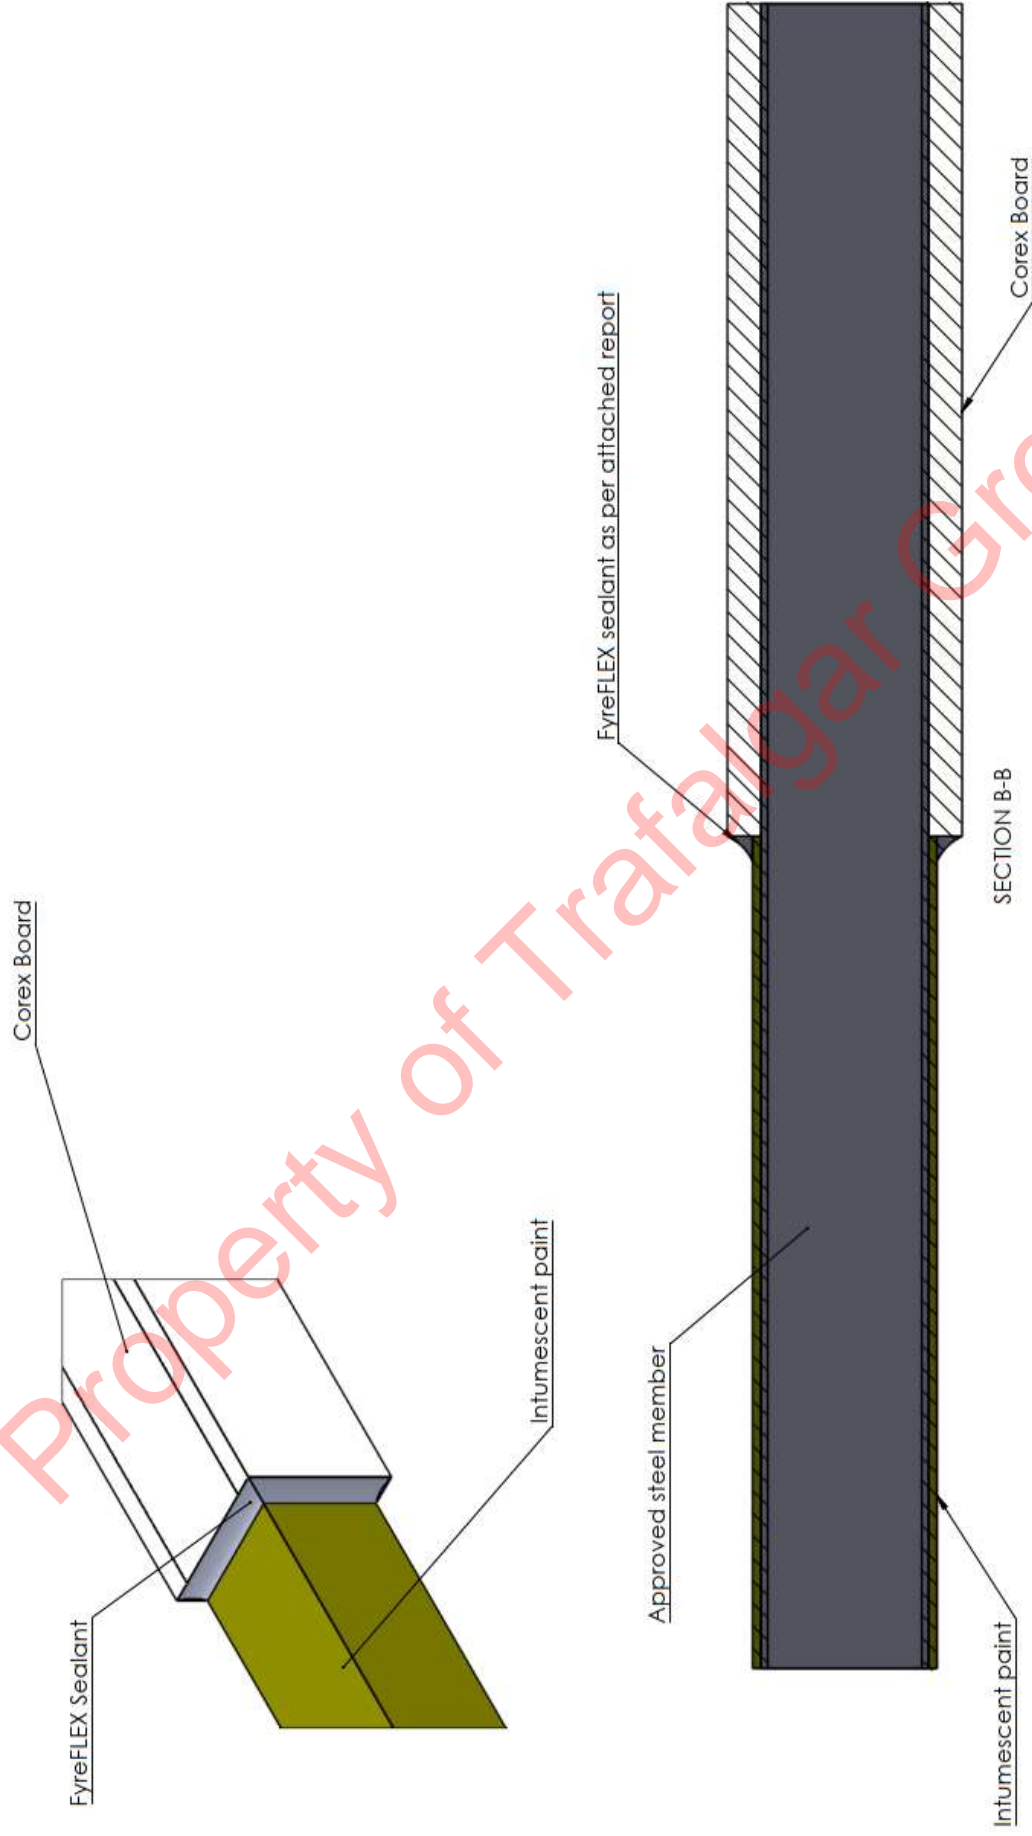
The construction detail when the board protection system is added next to the existing intumescent paint protection system – Option 2
